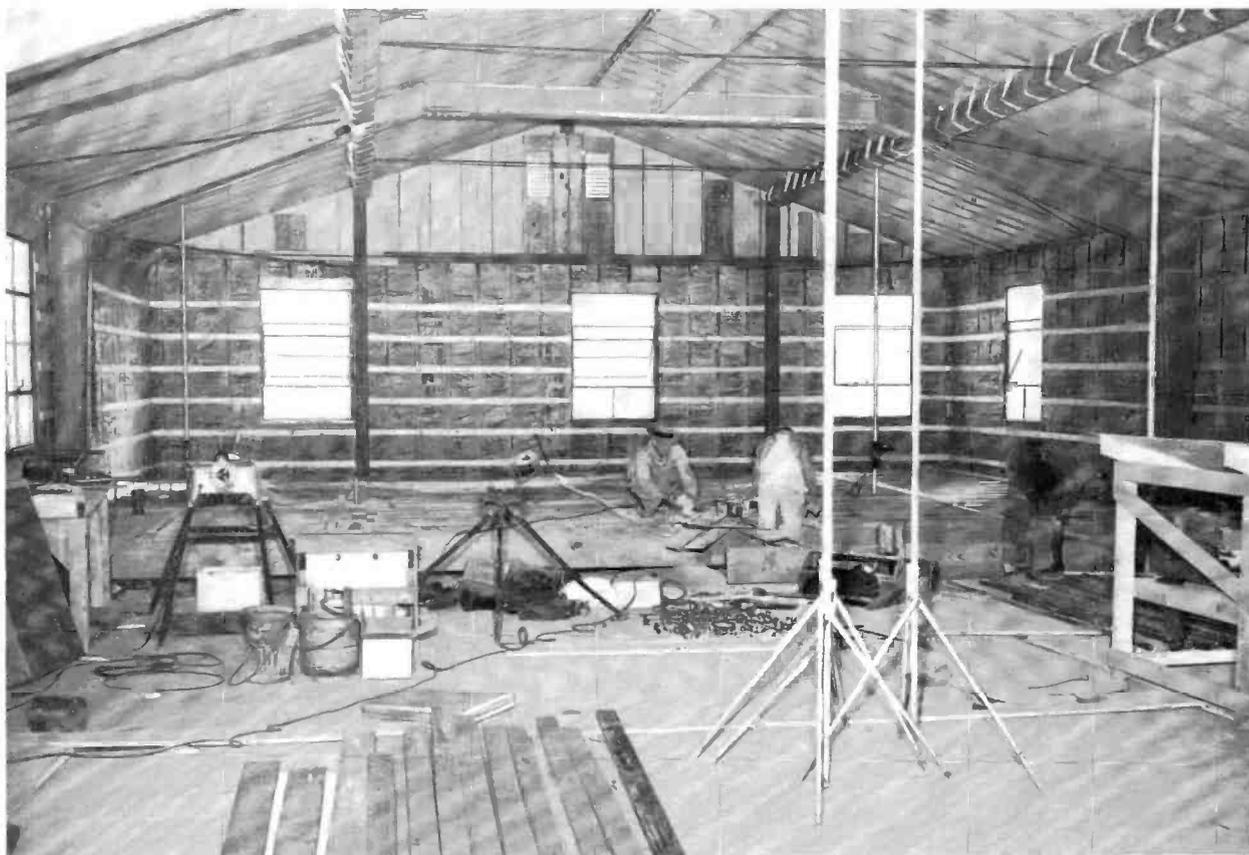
Interior of the building during construction. All surfaces exposed to outside are covered with 3-incl. fibreglas insulation. The living quarters, which are in the end of the building shown here, have wood floors. The rest of the building has a poured concrete floor.
